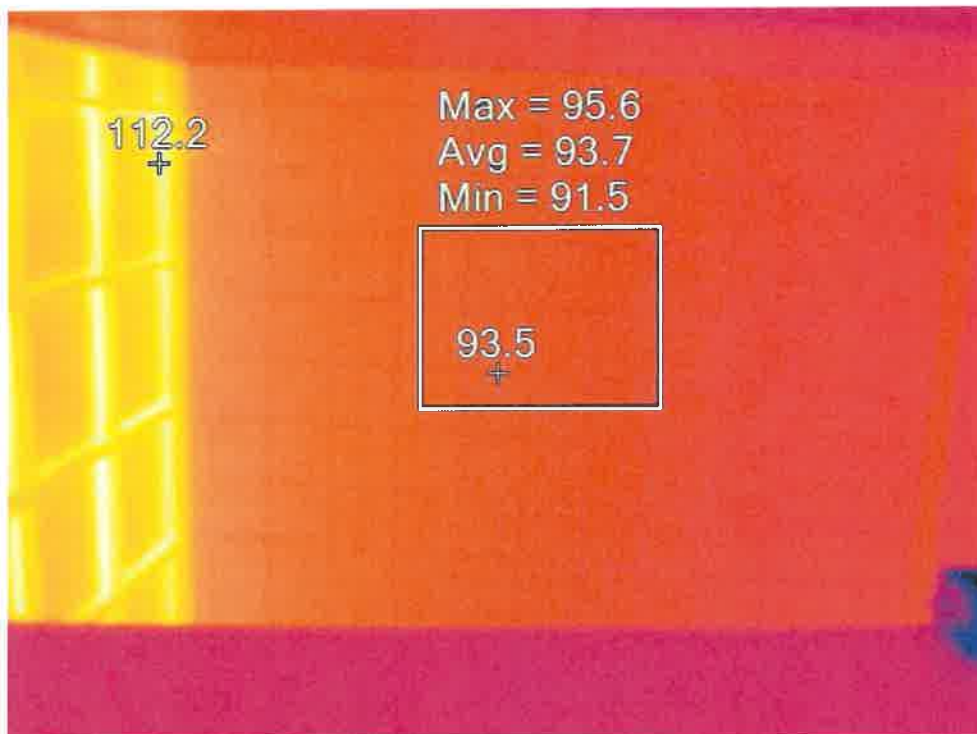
View of the ceiling using an infrared camera before commencing testing.
